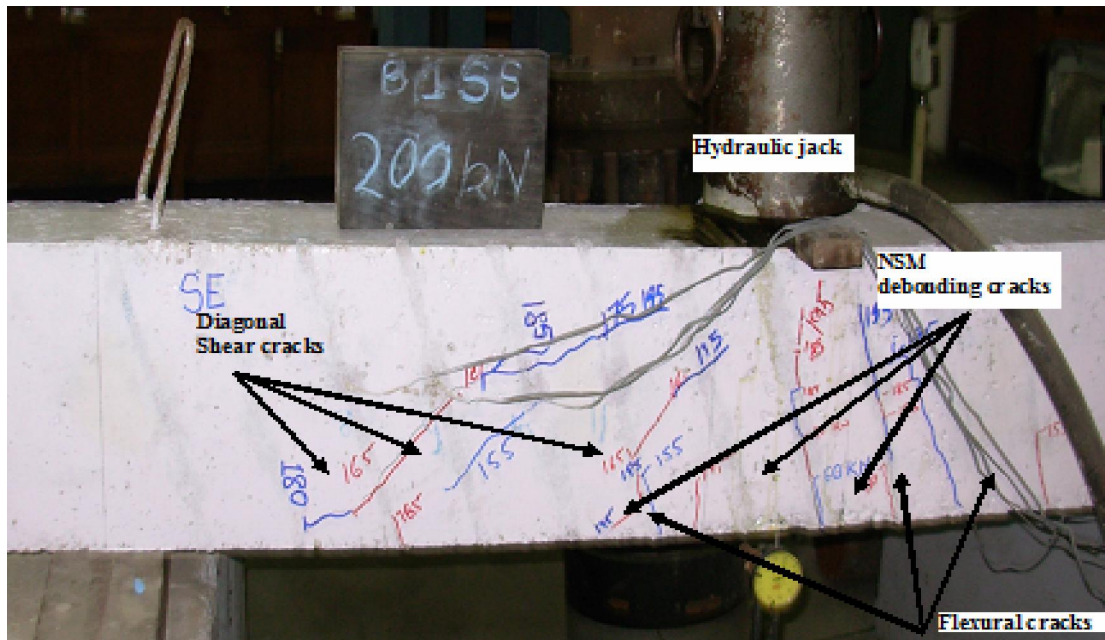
Test B1-SS final crack pattern at 200 kN (Face SE)
